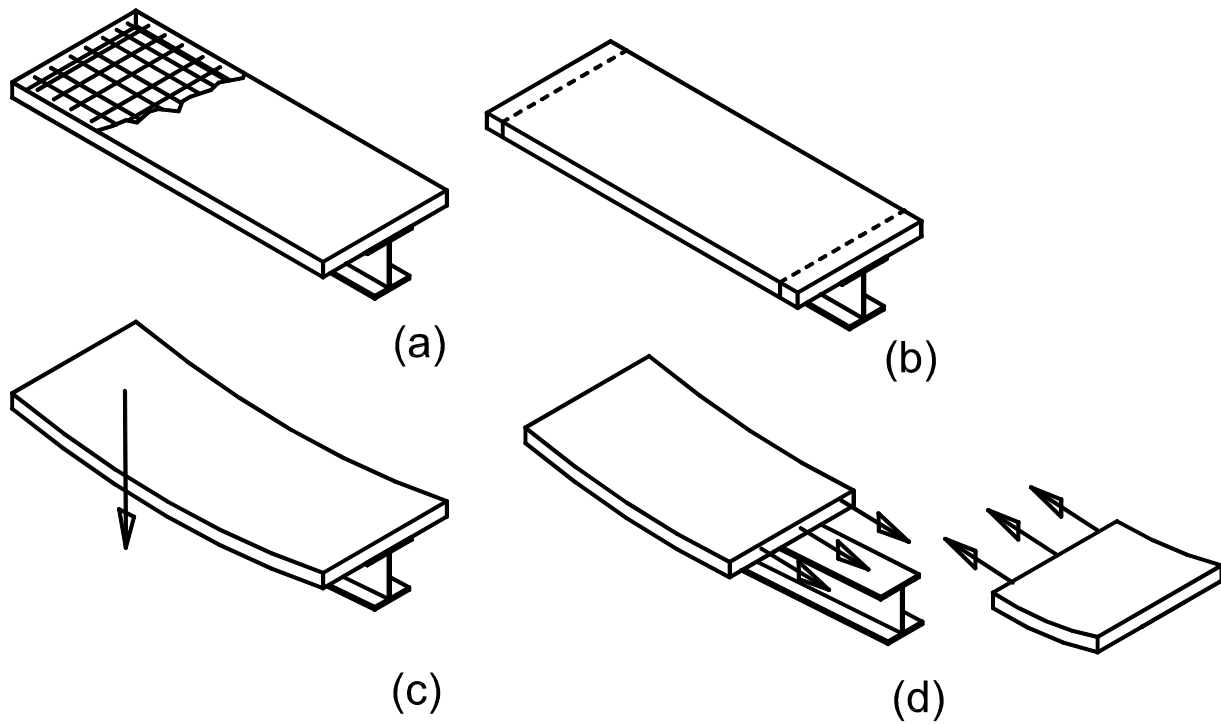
Mechanism of transverse cracking. (a) Concrete is poured. (b) Concrete shrinks, (c) Due to restraint from girder, concrete shrinkage produces downward deflection. (d) Tensile stress is developed in deck, which causes transverse cracks.
